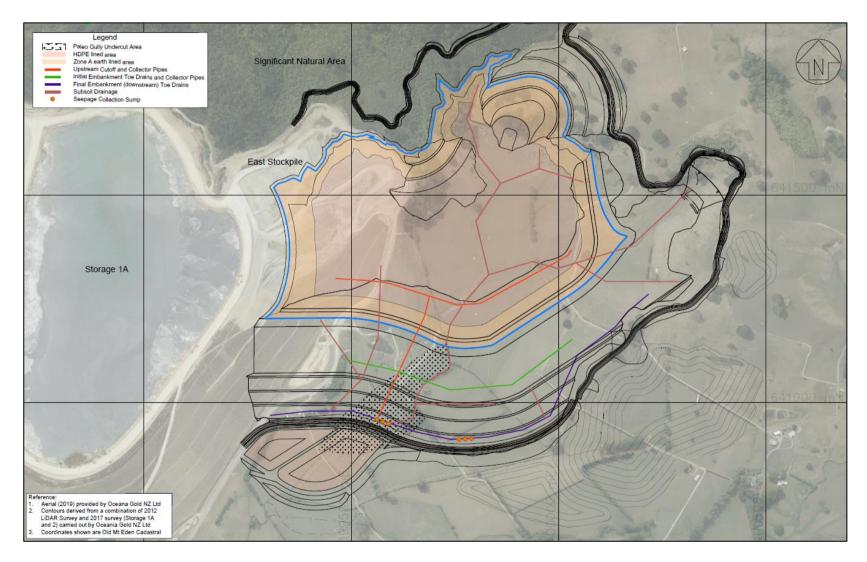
TSF3 Drainage Diversion Works (Source: EGL (2025c))
